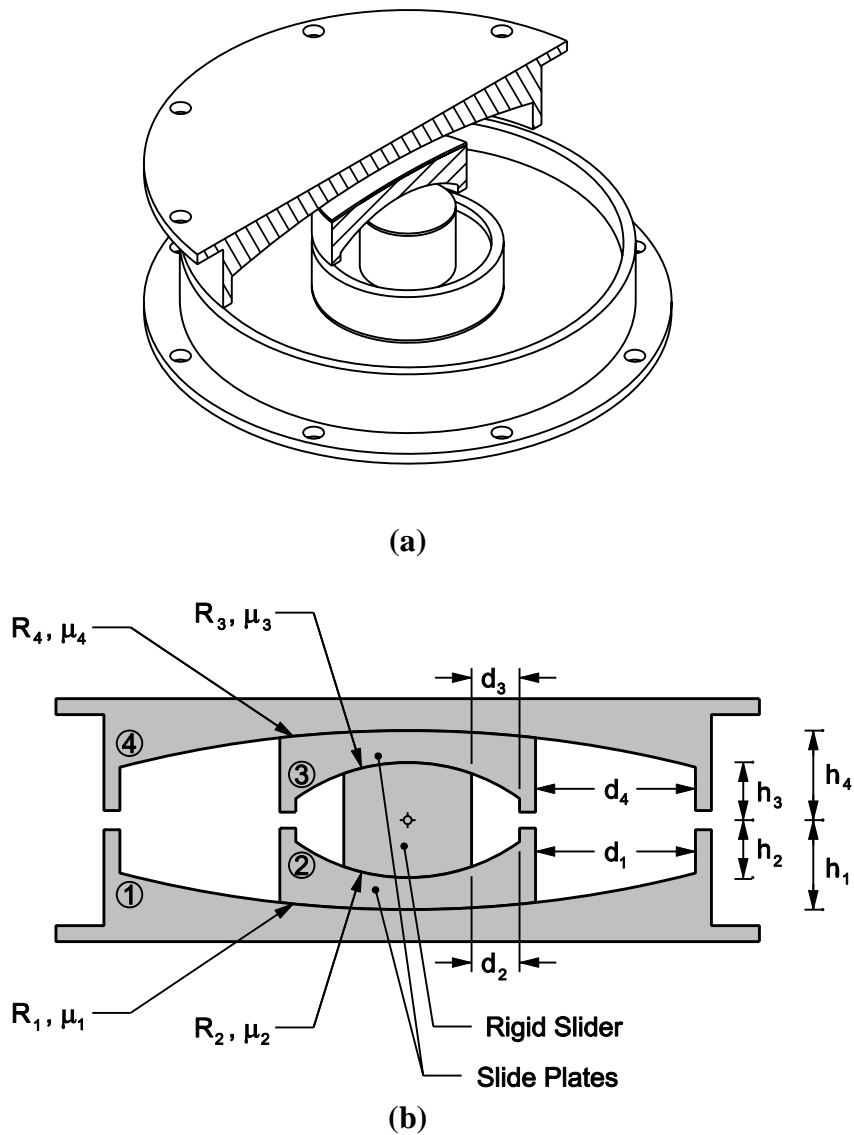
Cutaway (a) and Cross Section Views (b) of the Triple Concave FP Bearing
